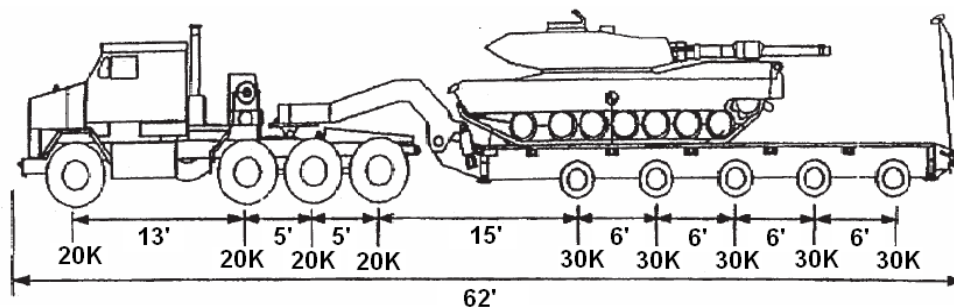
Proposed simplified U.S. Army Heavy Equipment Transporter
